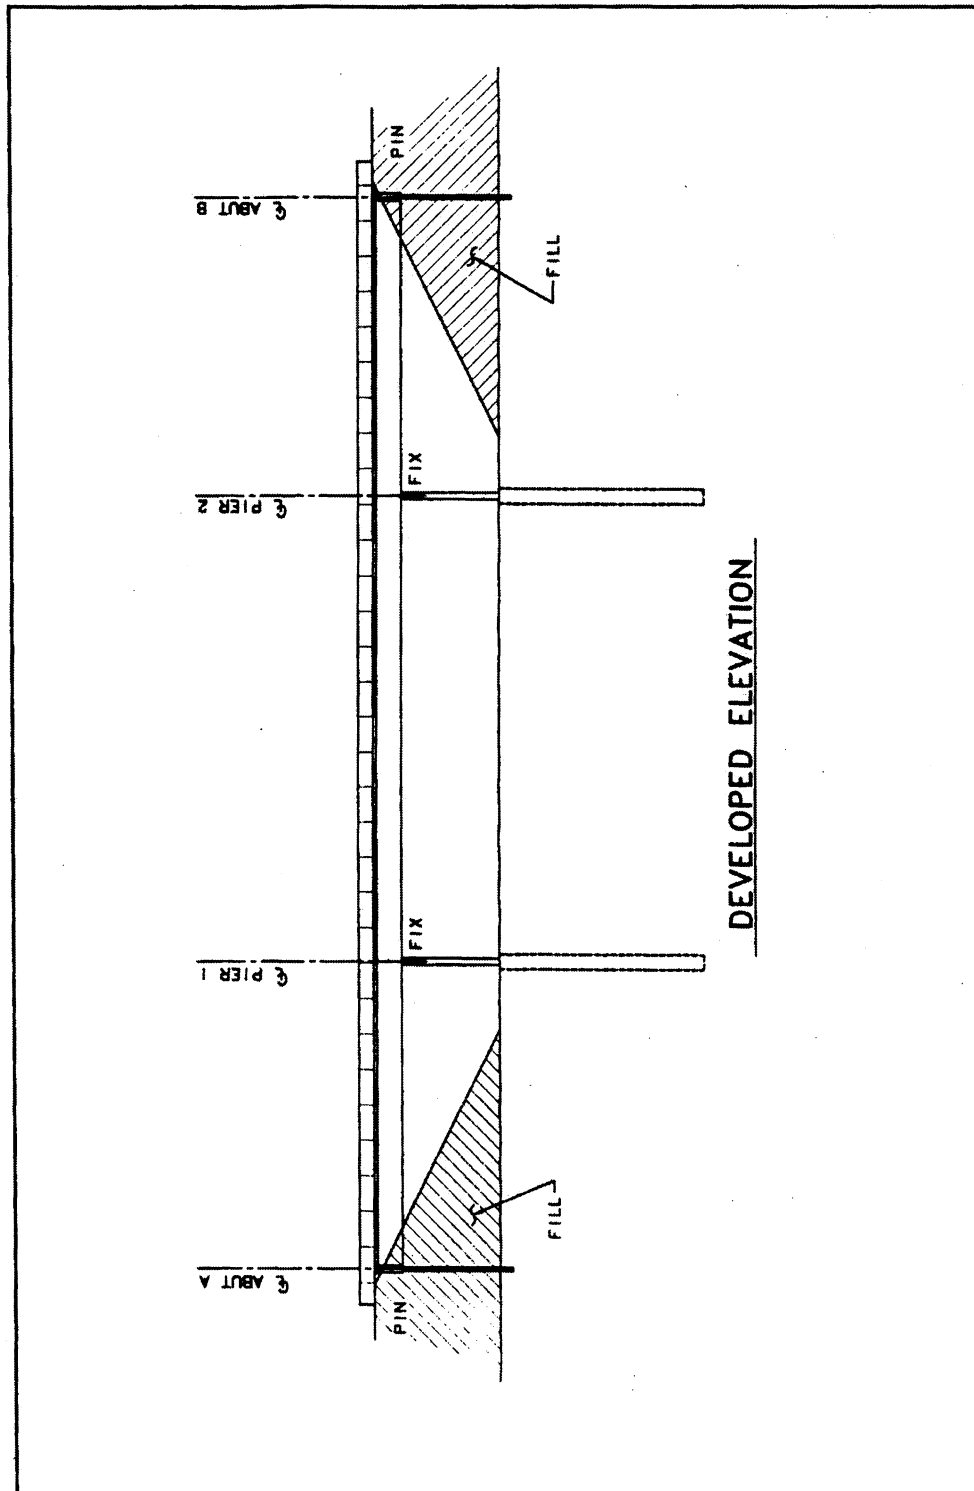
Bridge No. 6 – Developed Elevation
